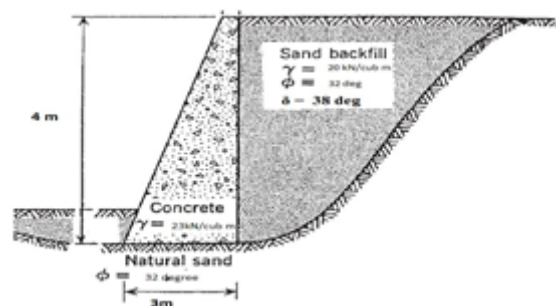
Sketch of Typical Retaining Wall Factor of safety for sliding and overturning
